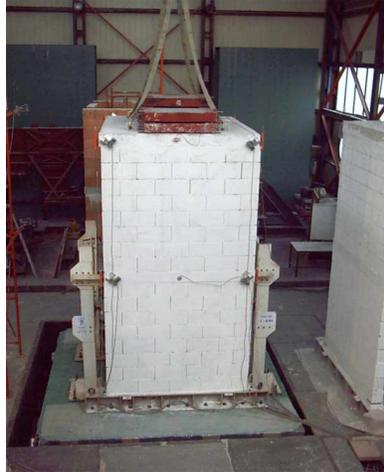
Instrumentations on specimen #1 ready for testing (LVDTs & Accelerometers)
